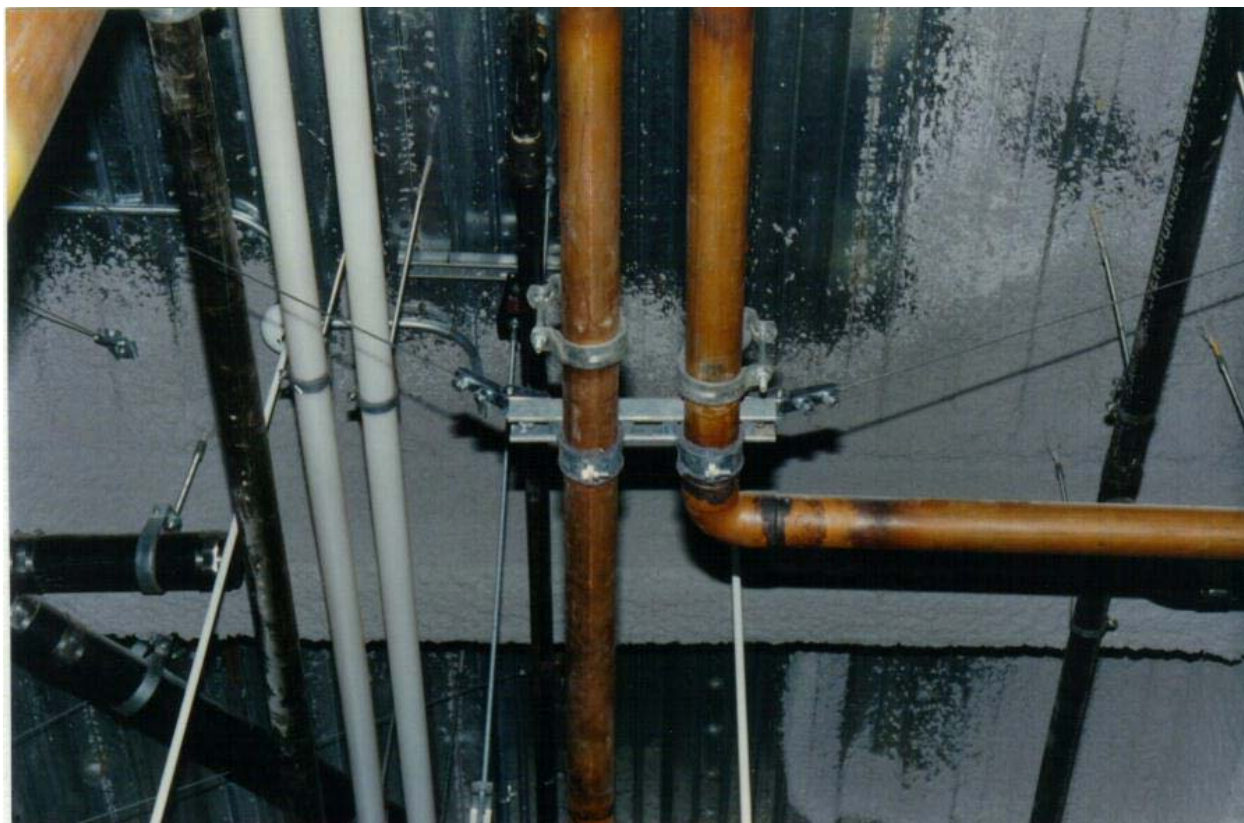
Cable bracing used to restrain overhead copper piping (Photo courtesy of Mason Industries).
